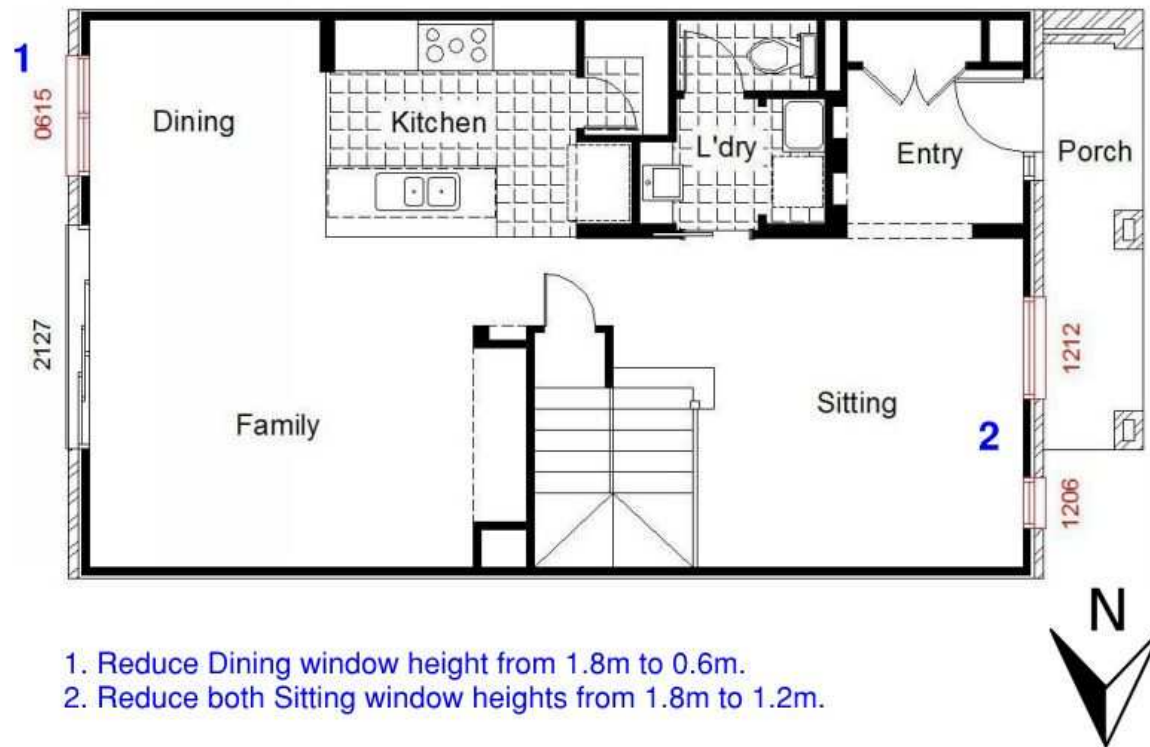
Redesigned ground floor plan for Dwelling 16 in Perth.
